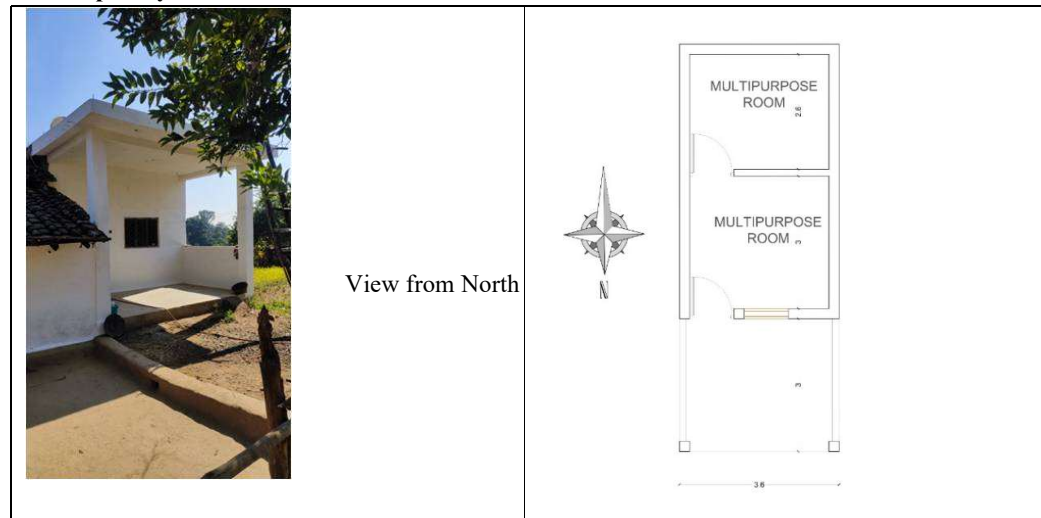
Front view and Ground floor plan of Traditional House with brick wall & mud mortar
